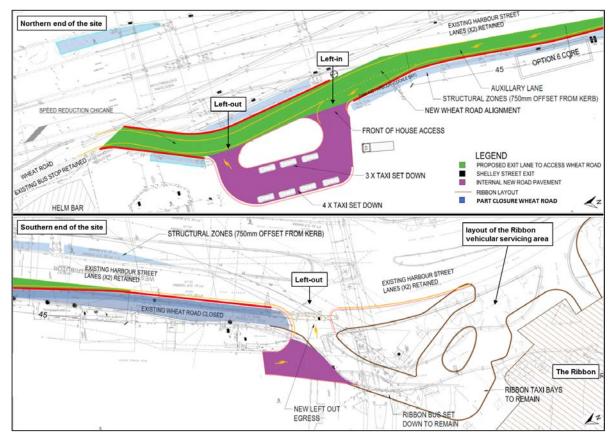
| Part closure and indicative layout of the realigned Wheat Road, site vehicle accesses, exits and porte-cochere circulation (source: Applicant's RtS)
